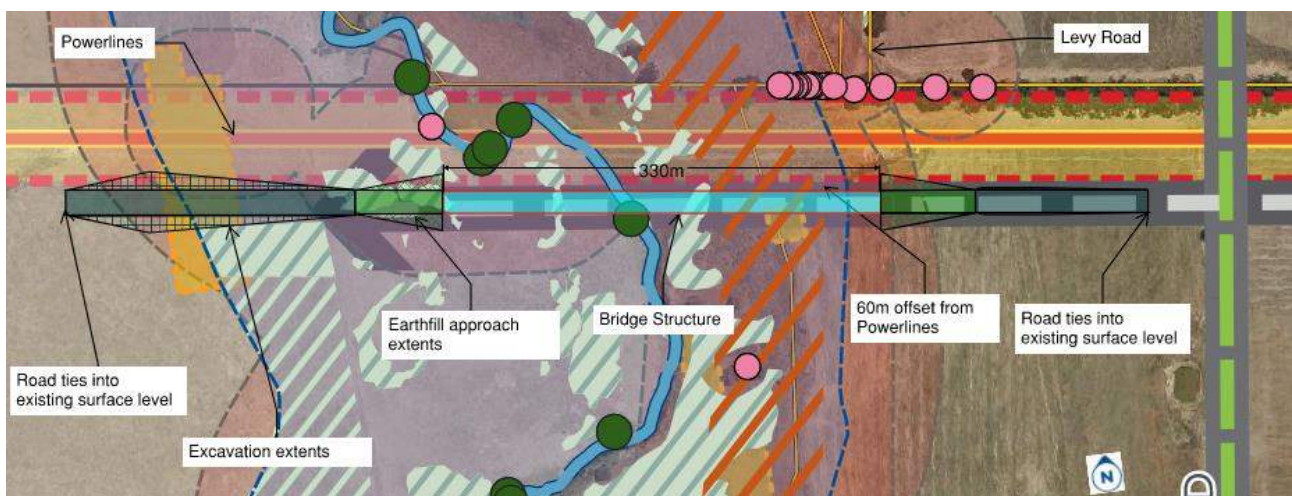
Option 2 – High Level Structure plan showing earthworks extents
